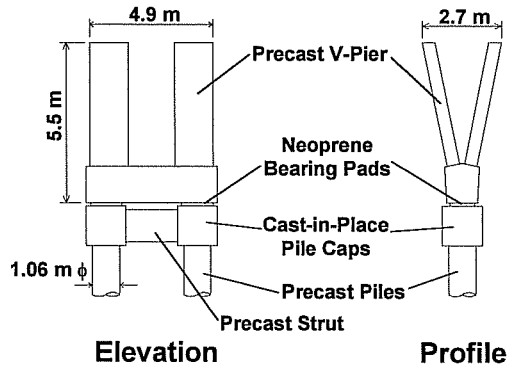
Unusual V-shaped piers, Long Key Bridge
